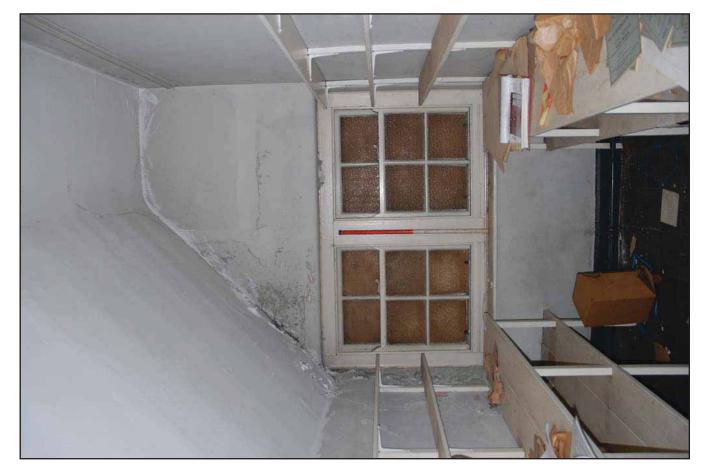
Extension A (Old Grammar School Block) - Room F02 view west. Scale: 1.0m
